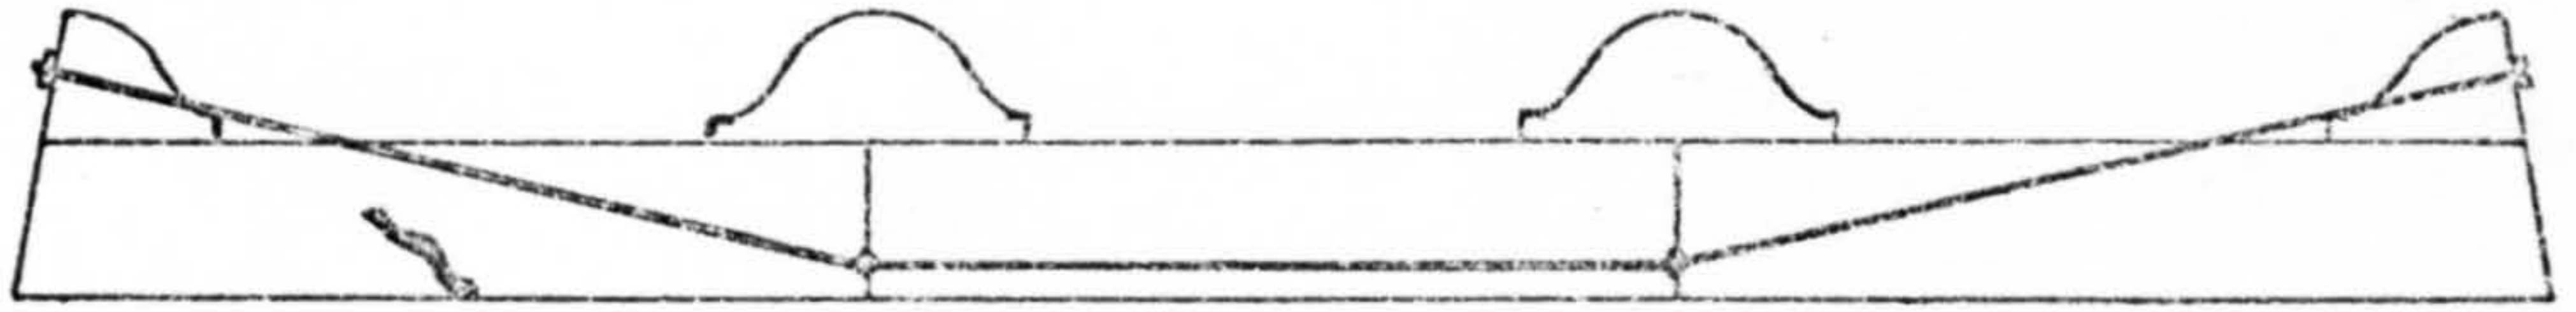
Inability of tension rods to prevent failure in the end portions of a trussed girder.
